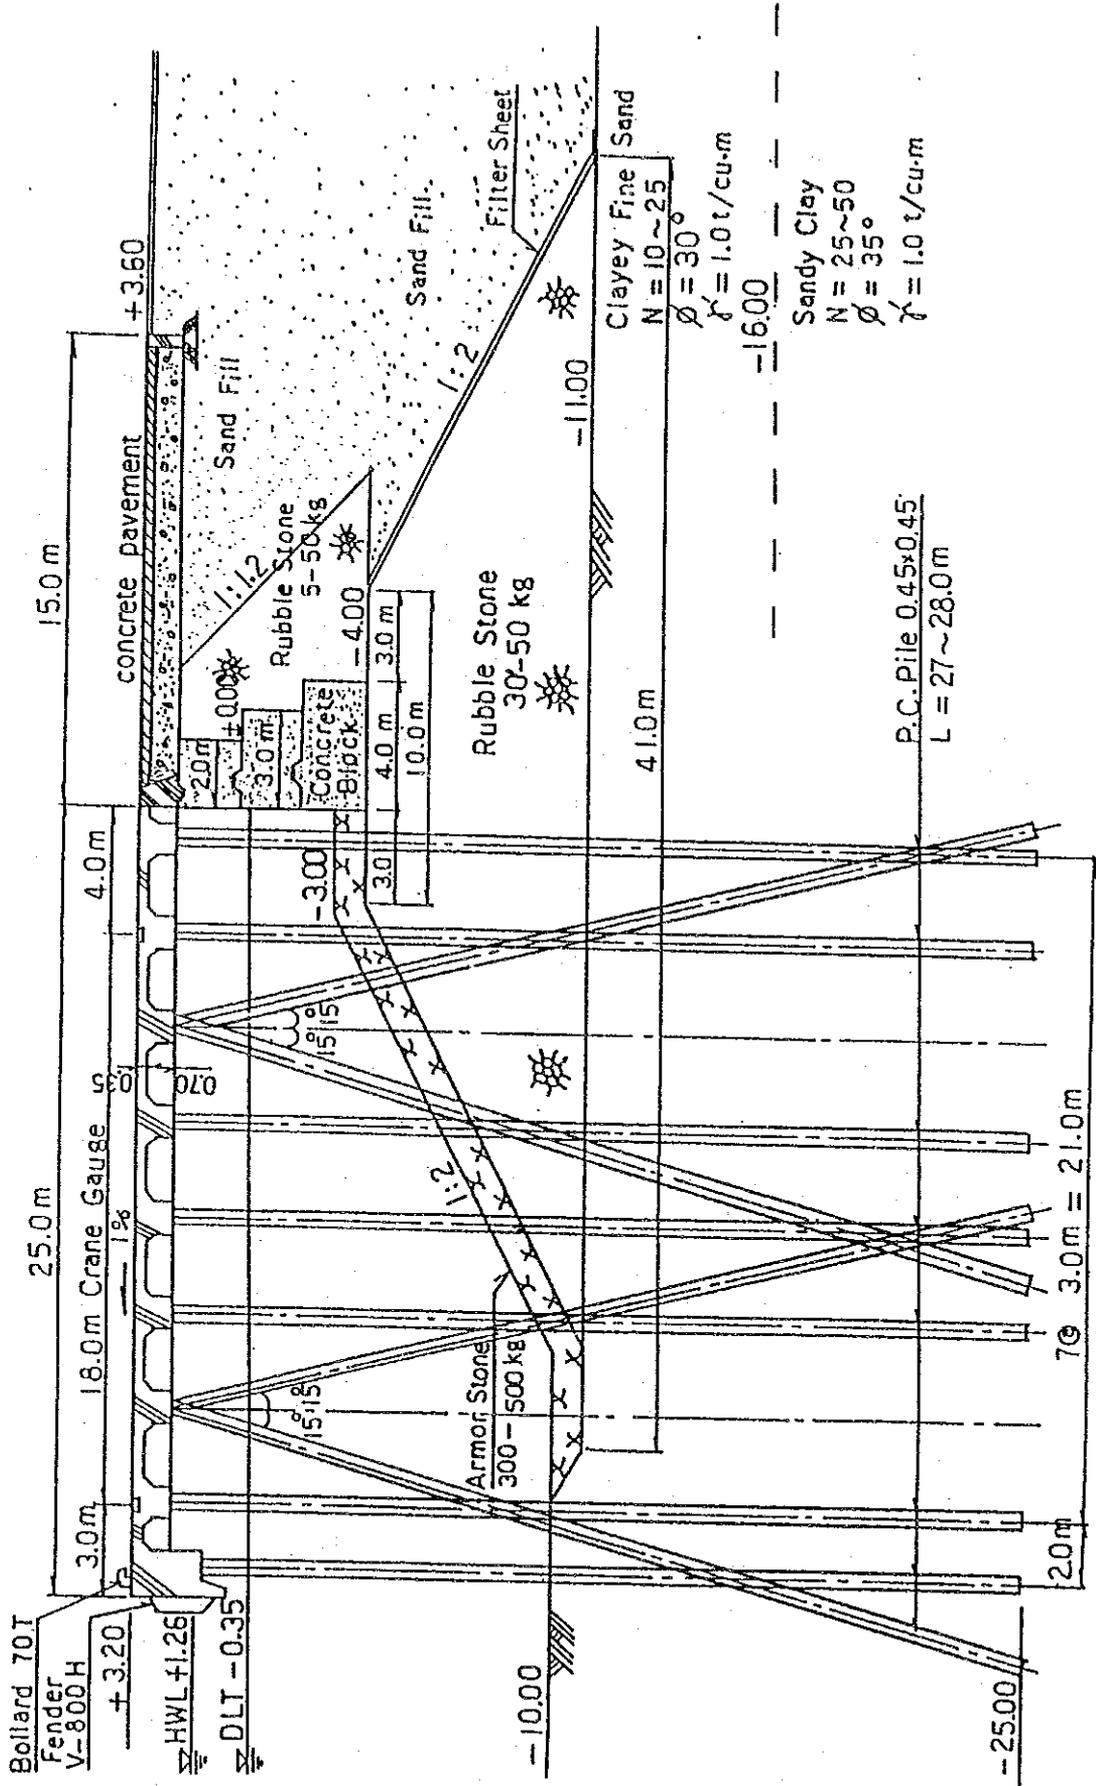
Typical Cross Section of -10m Container Berth at Manila North Harbor
